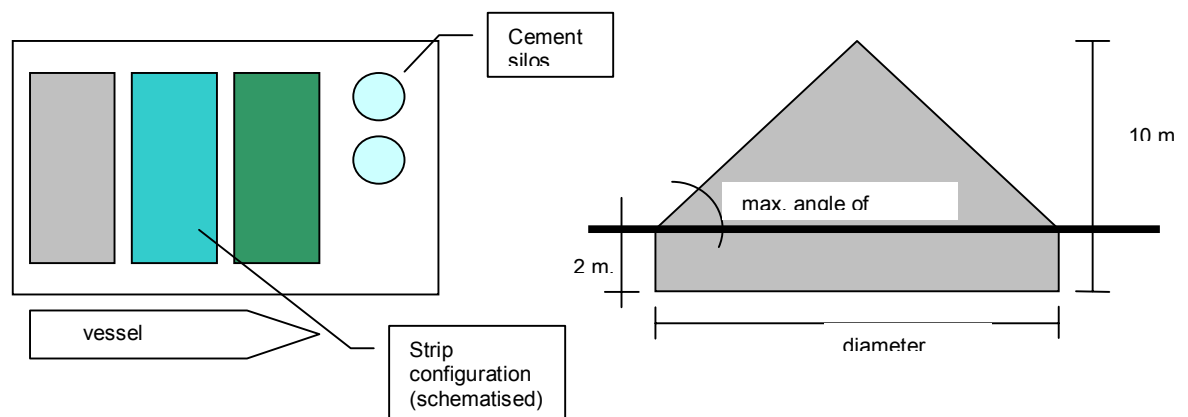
Overview of possible layout dry bulk terminal and cross section of bulk pile
